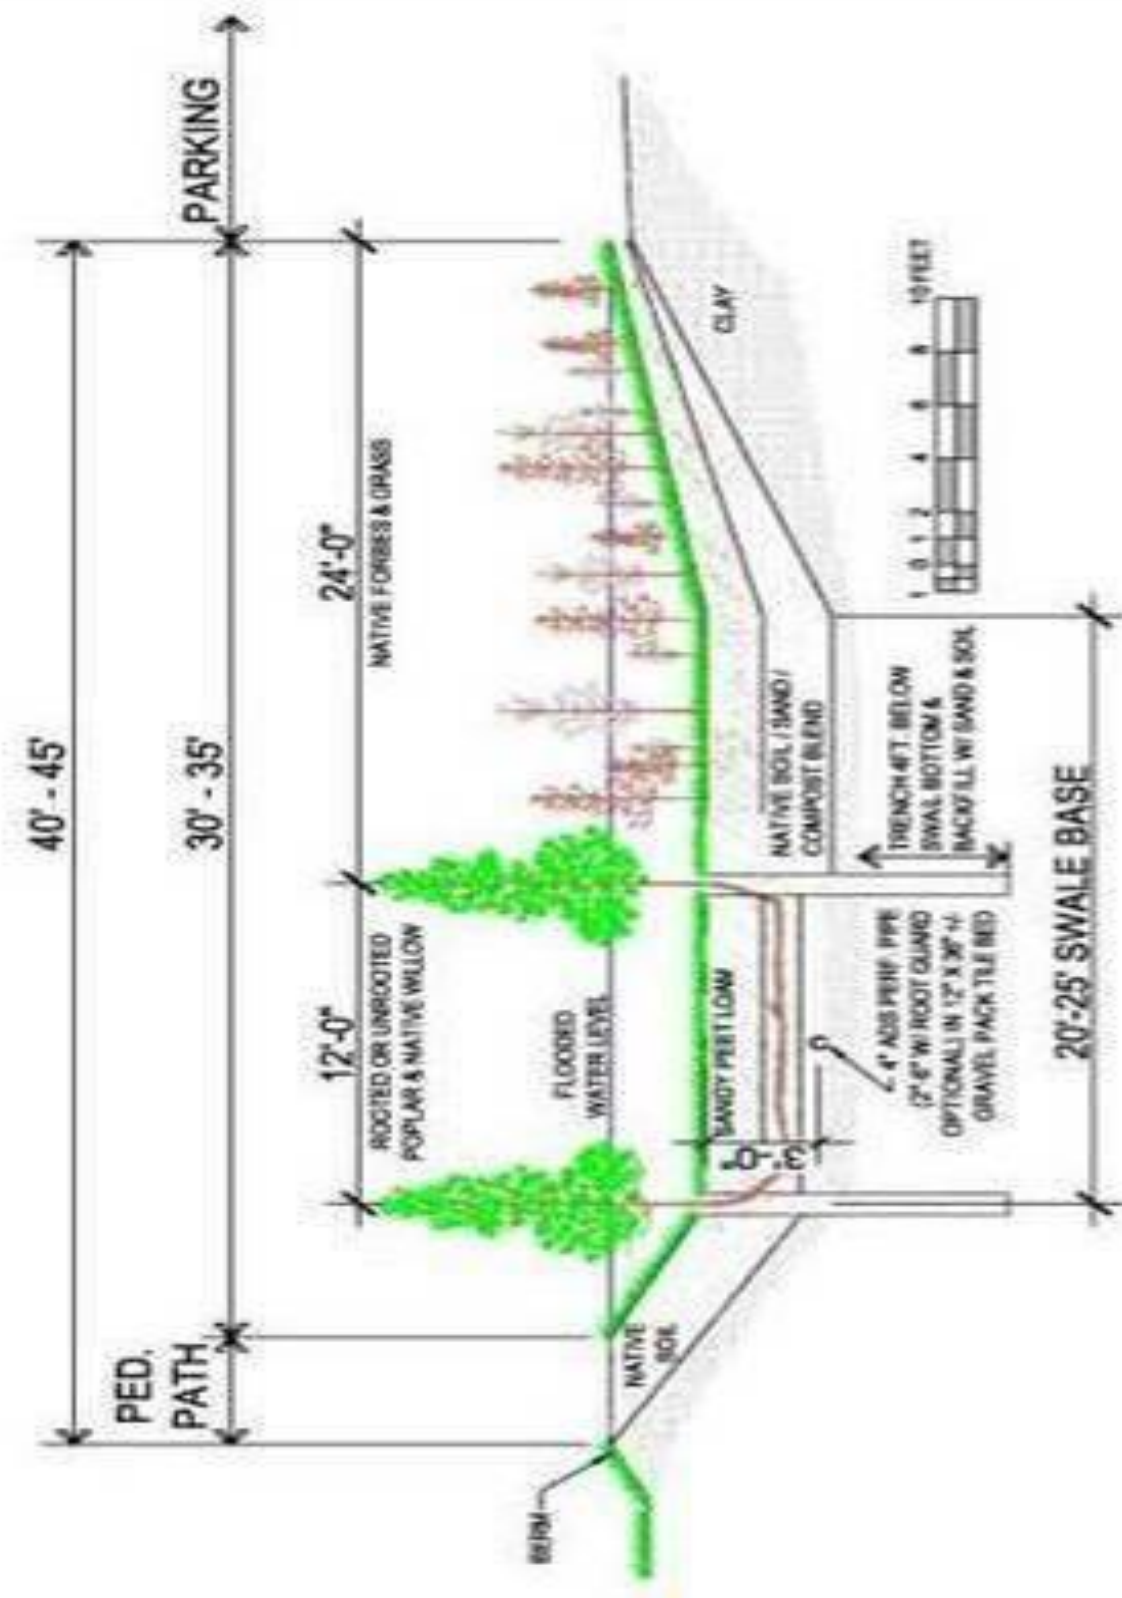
Proposed Phyto Buffer Rain Garden Plan View Section (October 2009)
